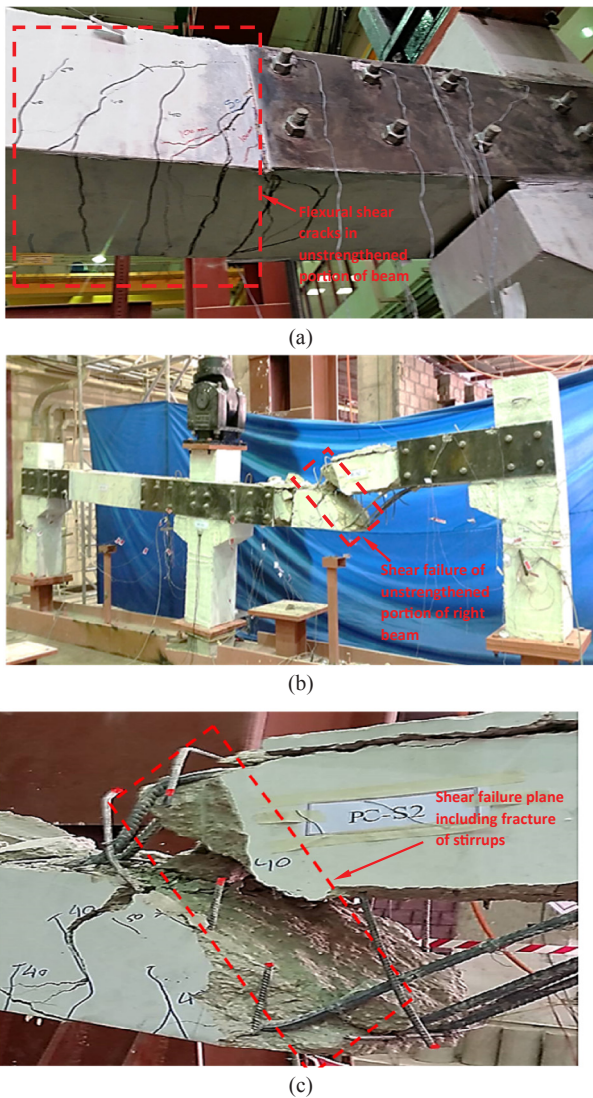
Mode of failure for strengthened specimen PC-S: (a) Flexure-shear cracking in beams; (b) Final deformed shape; (c) Close-up of beam shear failure.
